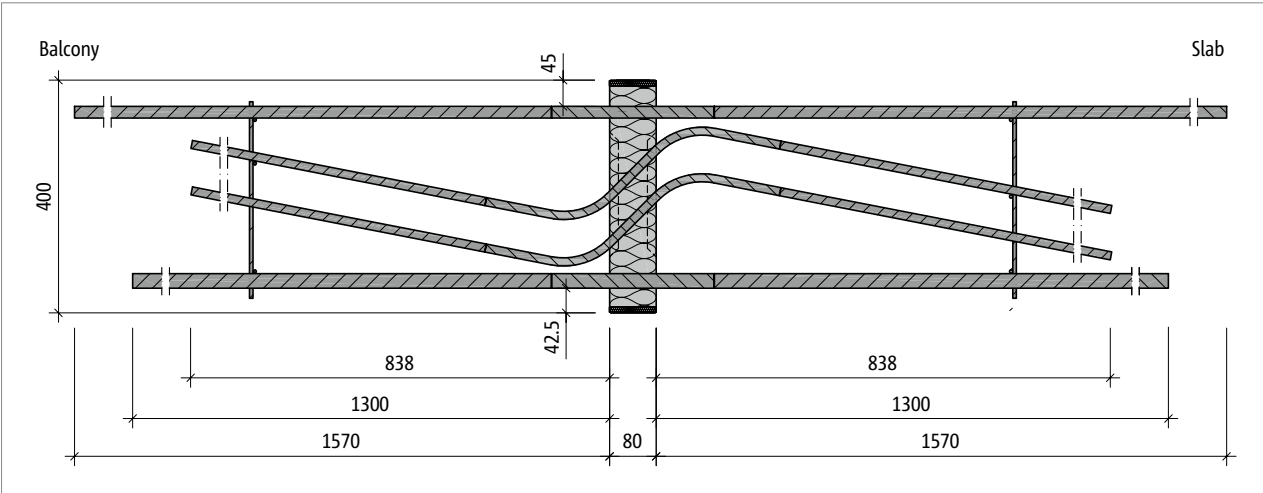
Schöck Isokorb® T type B-M5-V2 in height H400: Product section
